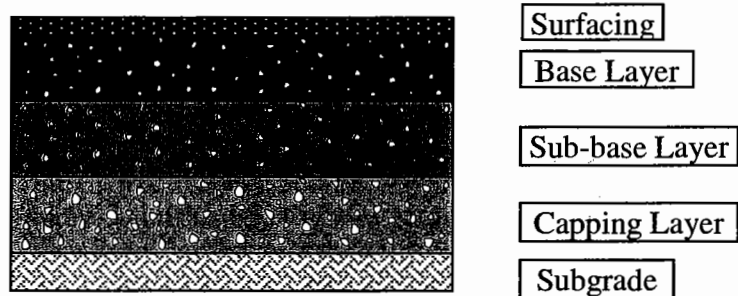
FLEXIBLE PAVEMENT IN EUROPE
